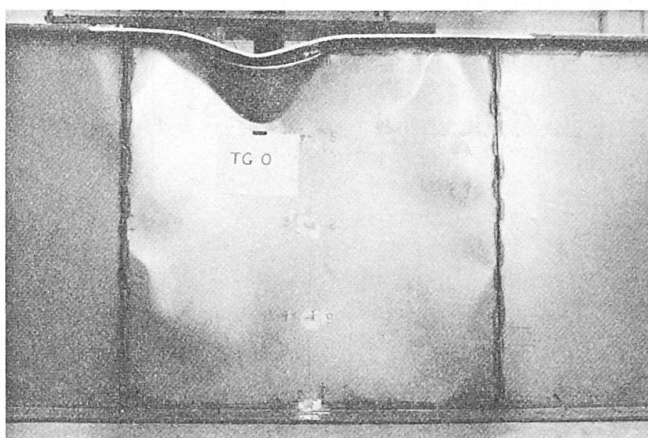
Illustration of failure due to inward collapse of compression flange [24].
